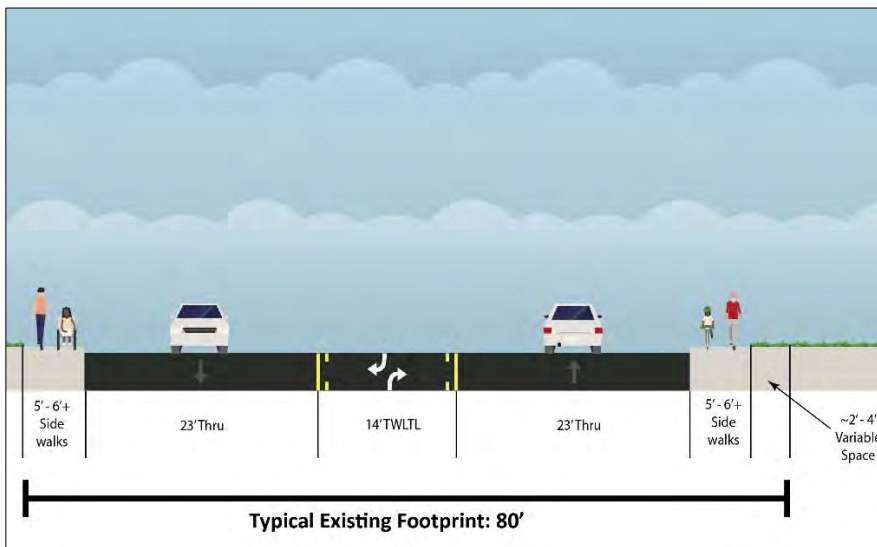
EXISTING ORO-DAM BOULEVARD CROSS-SECTION
